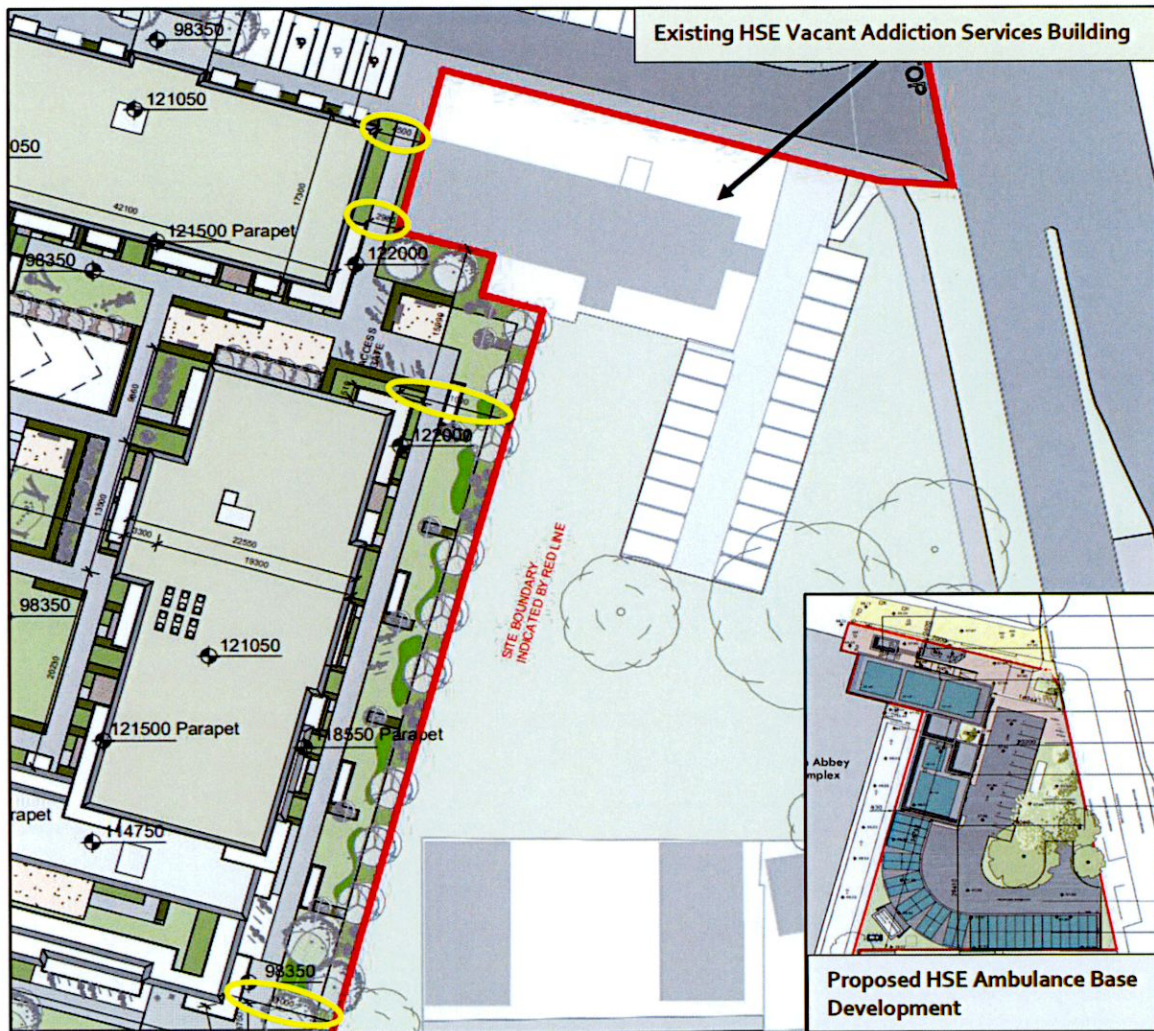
Site Layout (Roof) Plan for the Permitted Glen Abbey SHD Demonstrating the Boundary Distances between the Existing HSE Building and the Adjacent Proposed Development (Annotated Boundary Distances Indicatively Circled in Yellow)
